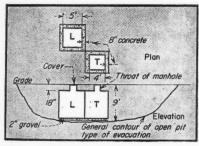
Plan and elevation of typical vault and manhole, with contour line showing approximately the extent of an open hole excavation.
